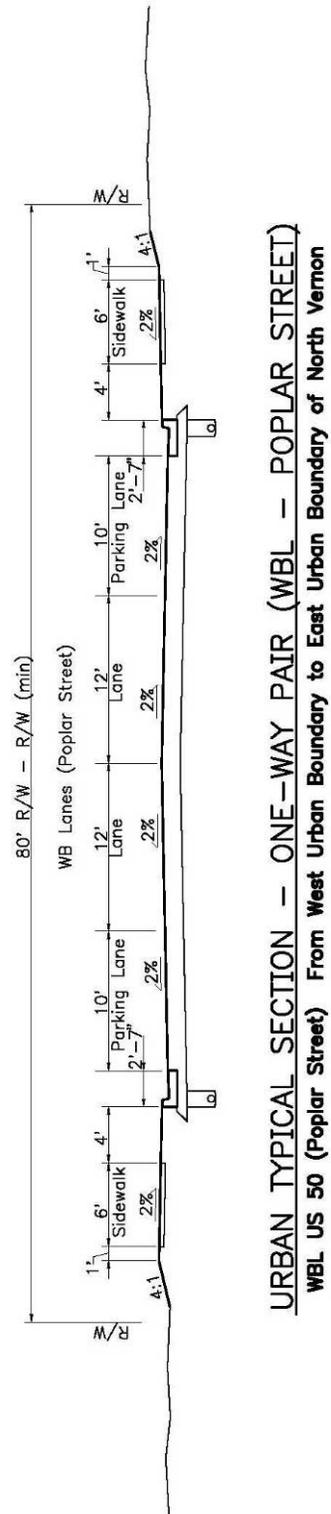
Urban Typical Section, Eastern Section One-Way Pair through North Vernon (Poplar Street (WB US 50))
